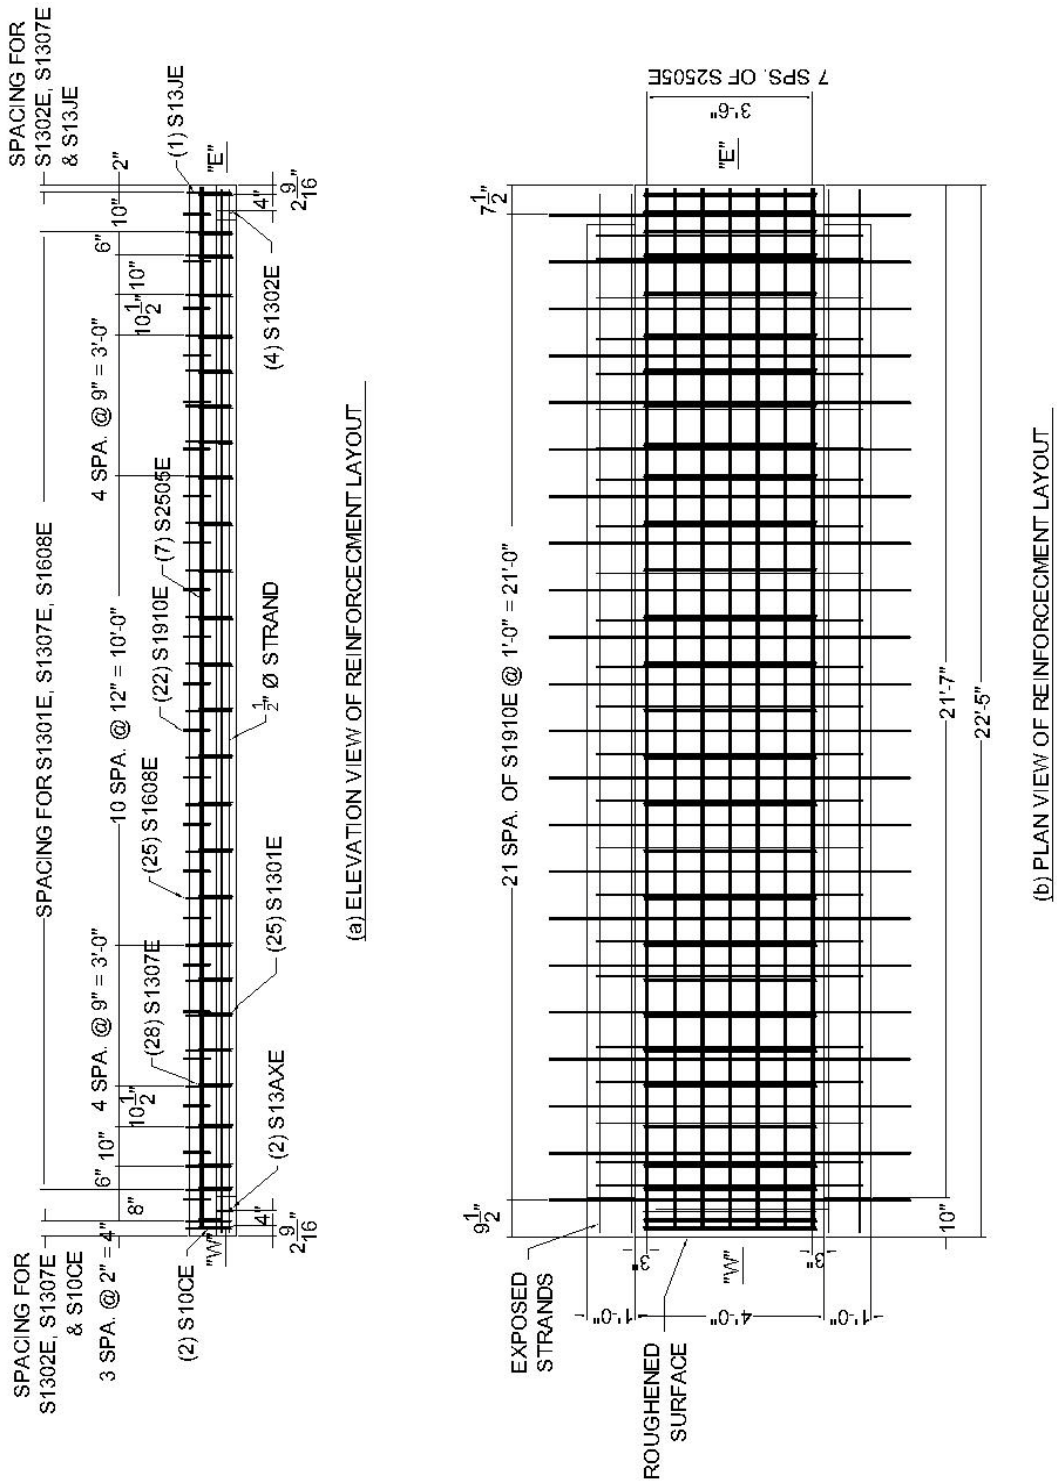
Elevation and plan views of reinforcement layout for precast beam 2N
